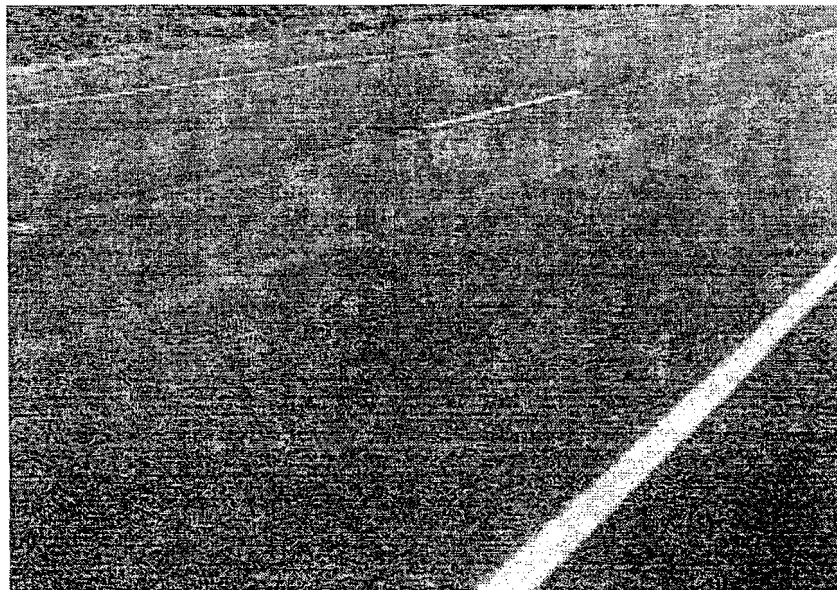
Test Section on Southbound Lane on Hwy 385 outside Crane, TX
